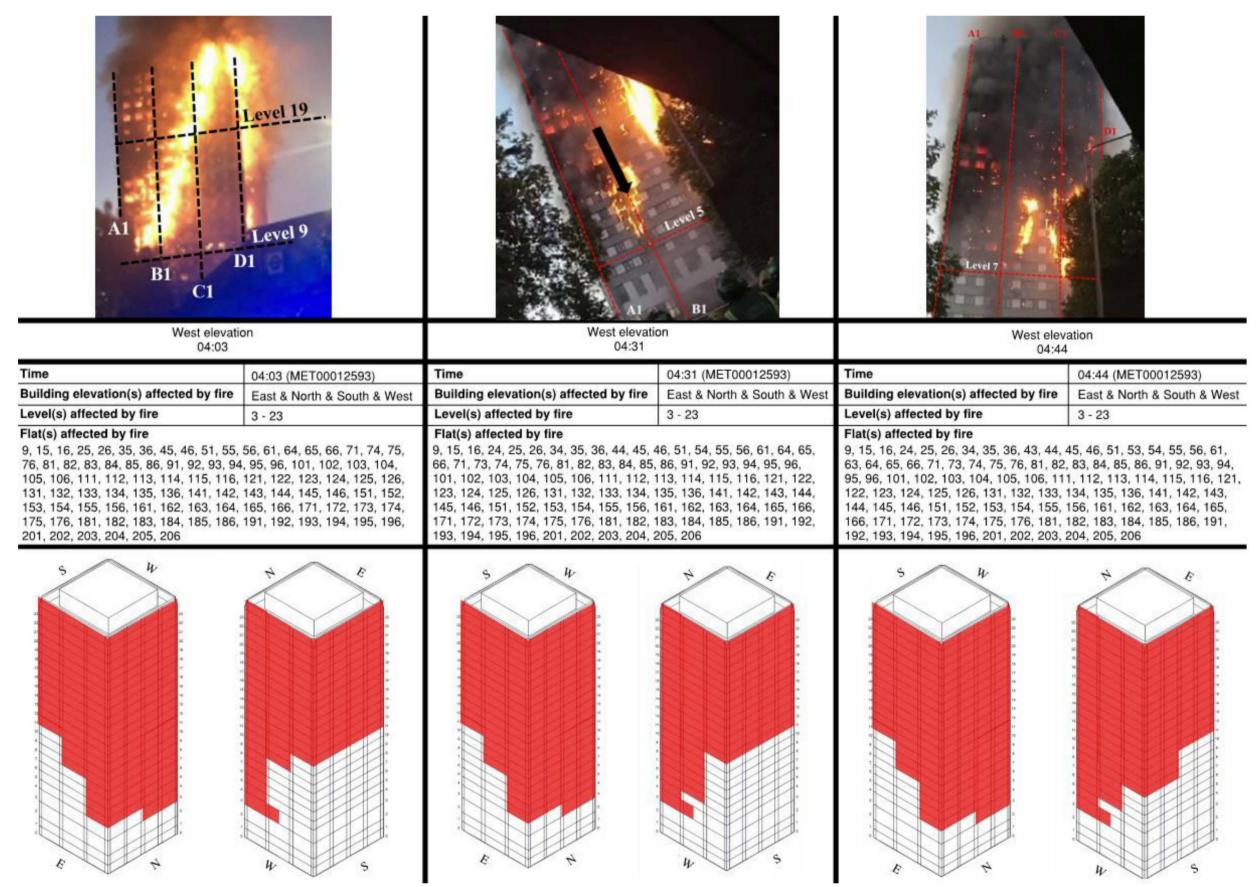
External fire spread on the all elevations of the building envelope and the impacted flats, between 04:03 and 04:44 (MET00012593)
